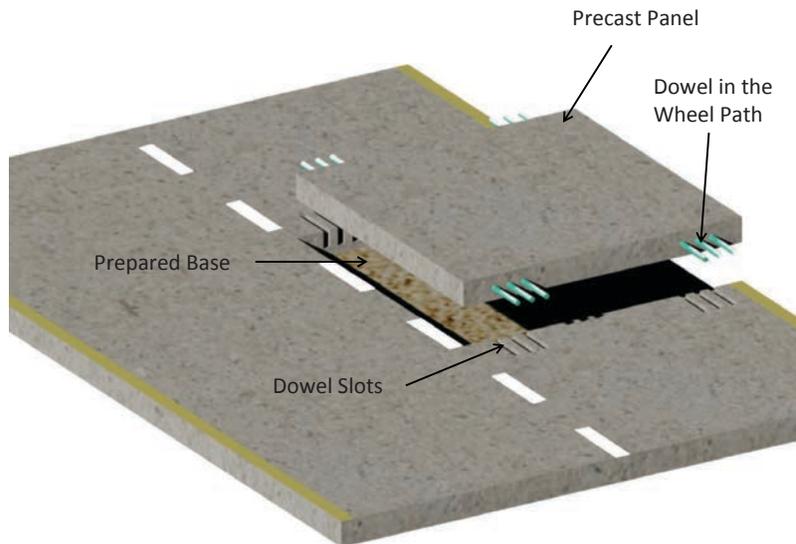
Variation of intermittent repair technique with slots for dowel bars cut in existing concrete pavement.
